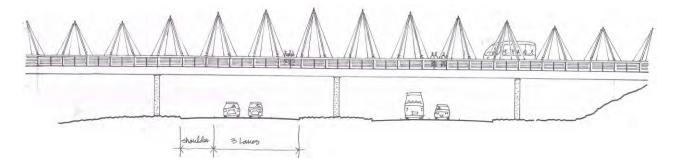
Elevation View, Widening Existing Bridge by Use of Cable-Stayed Structure
